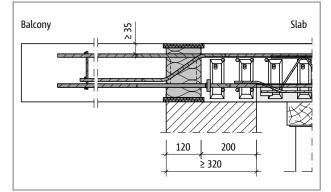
Schöck Isokorb® XT type C: Prefabricated slab with edge support with thermal insulating masonry (section XT type C-L-CV35, view XT type C-R-CV50)
